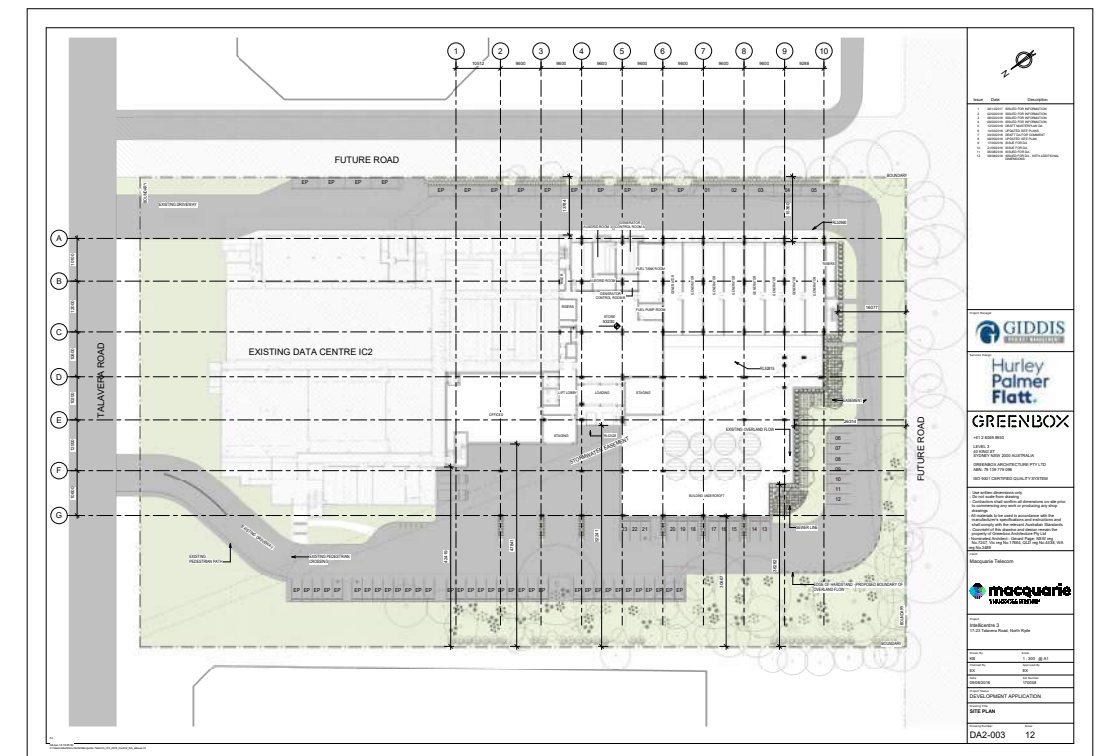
DA Approved IC3W - Site Plan (Source: Greenbox)
